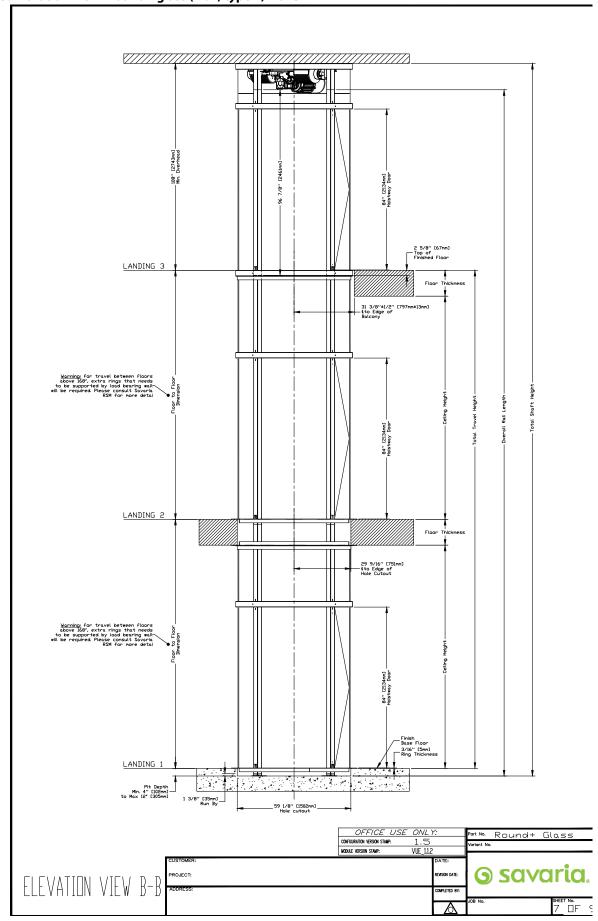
Pit cutout/thru-floor cutout - round+ glass (RGL) type 1, 2 or 3
